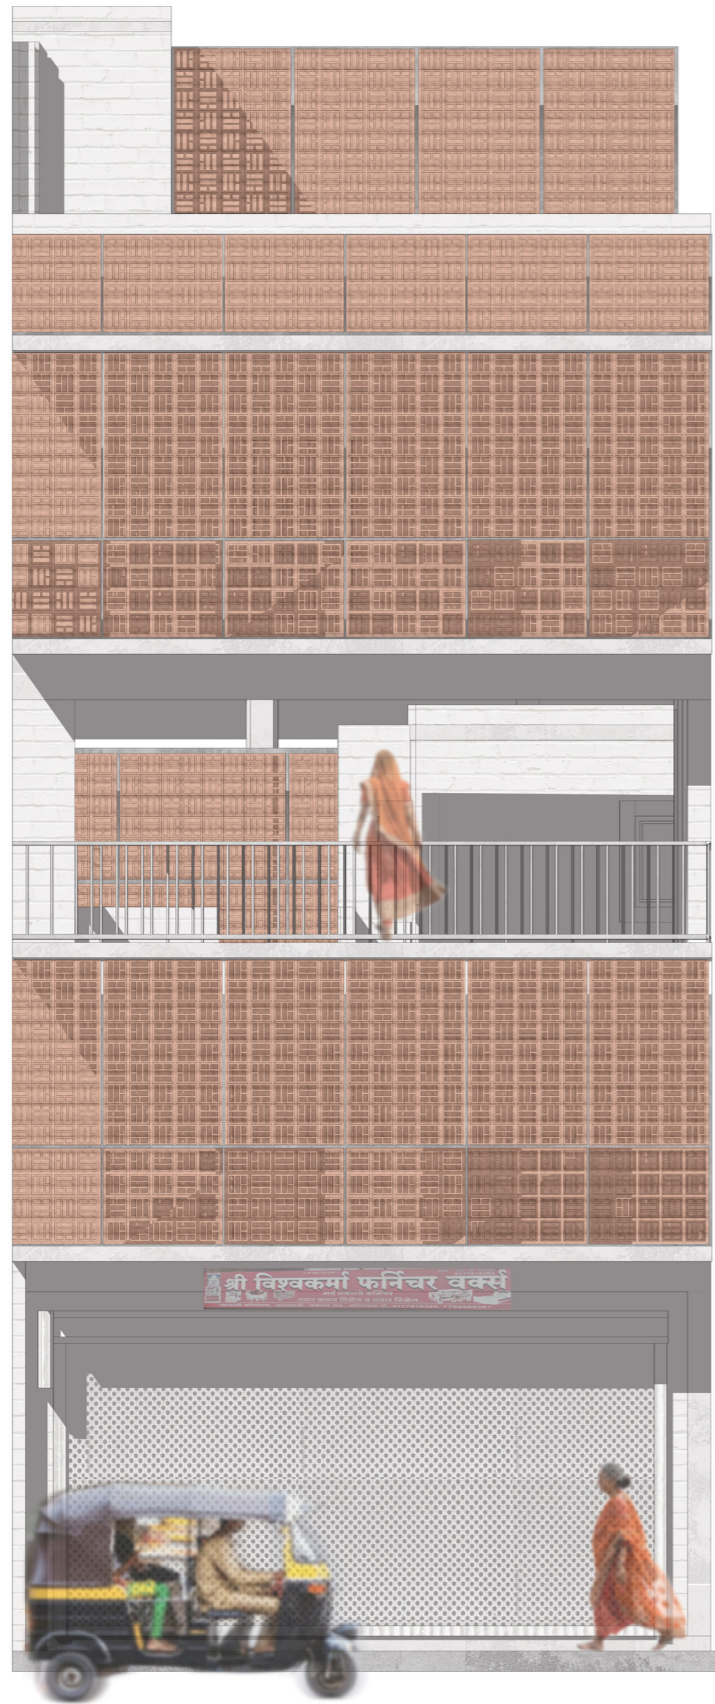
, Elevation showing the commercial strip and apartment floors above (author's work, 2026)
